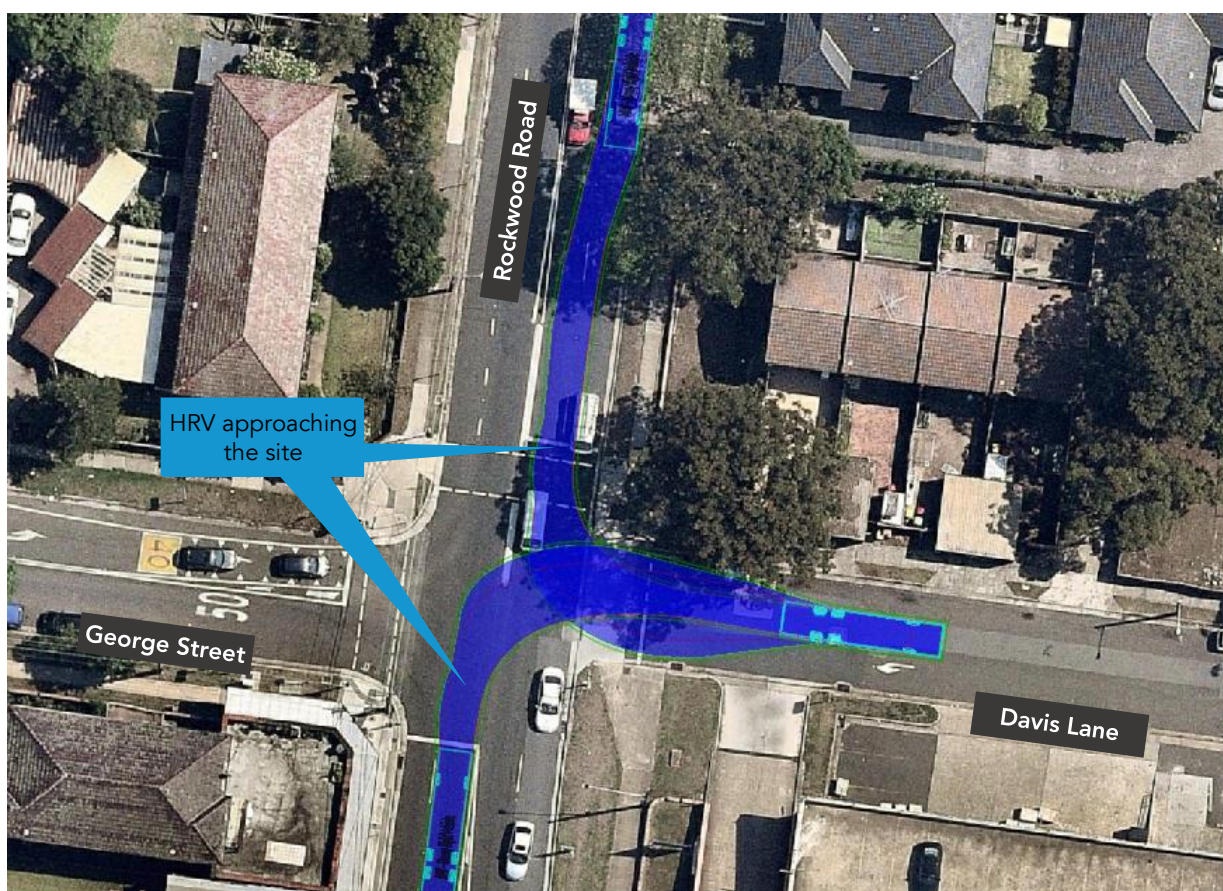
HRV approaching the site from north and south via Rockwood Road
